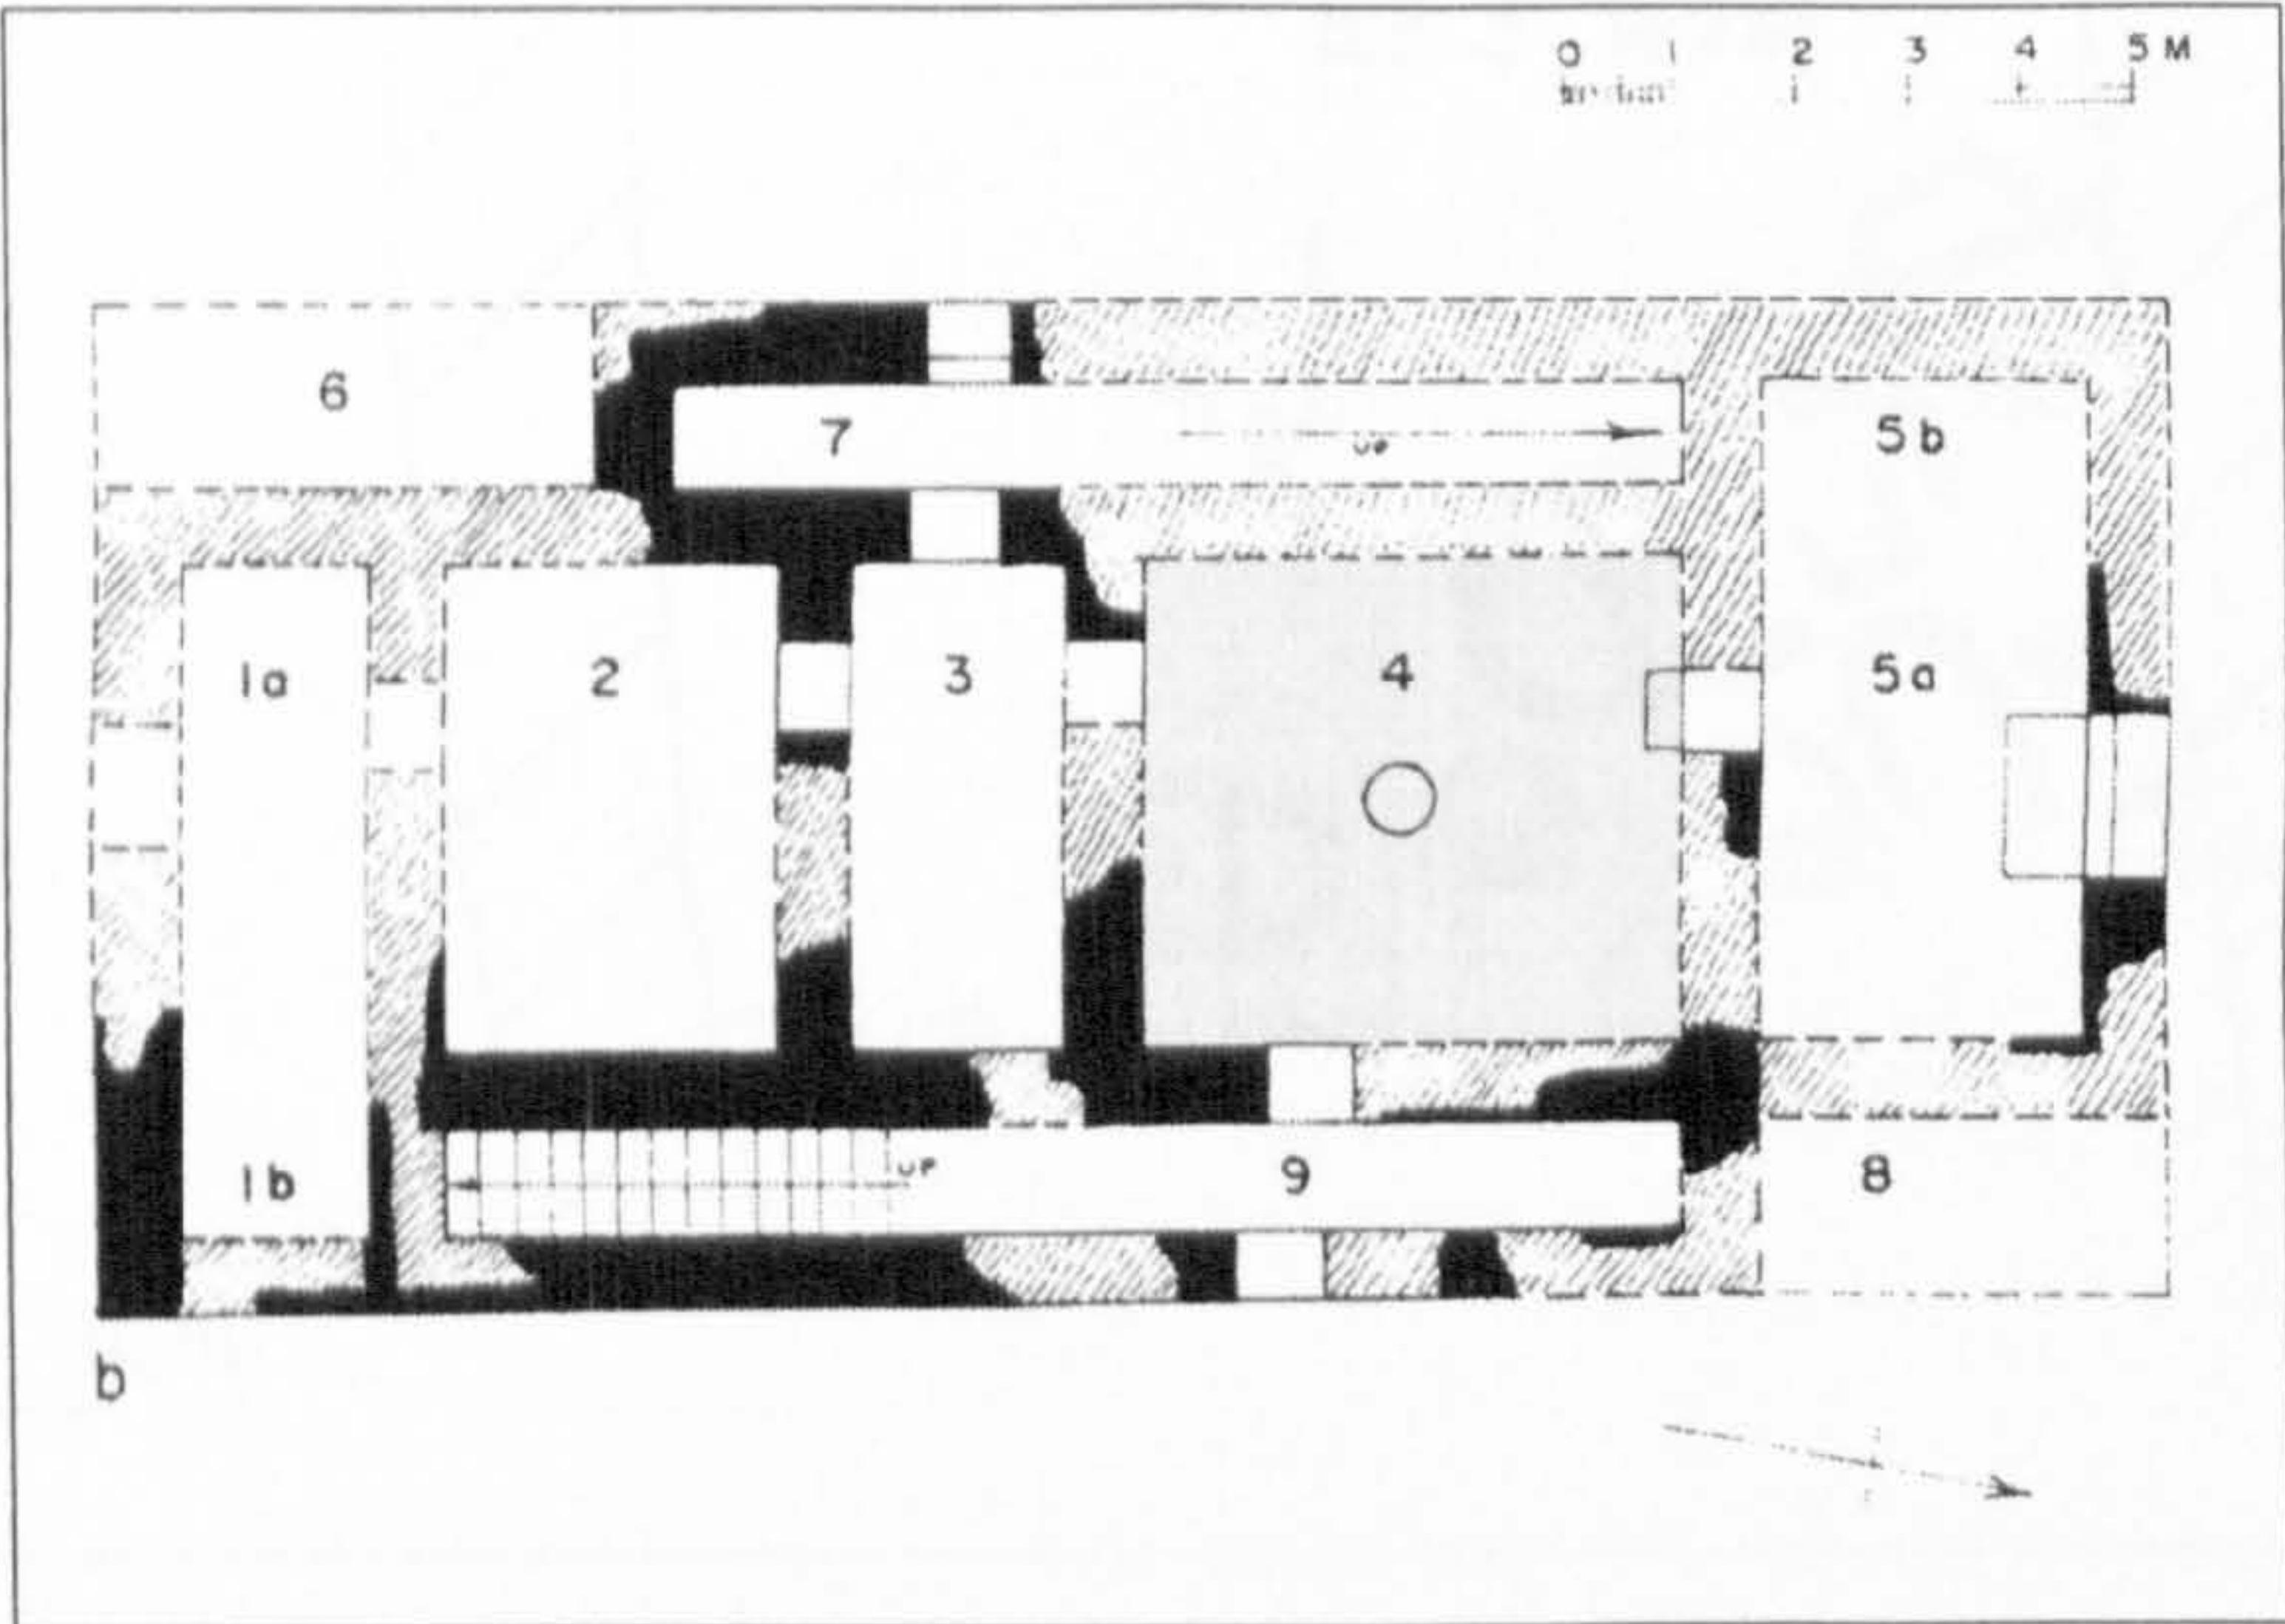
Kolonna, “Weisses Haus”: Plan of ground floor; hearth room shaded (adapted from Shaw 1987: Fig. 6b).
